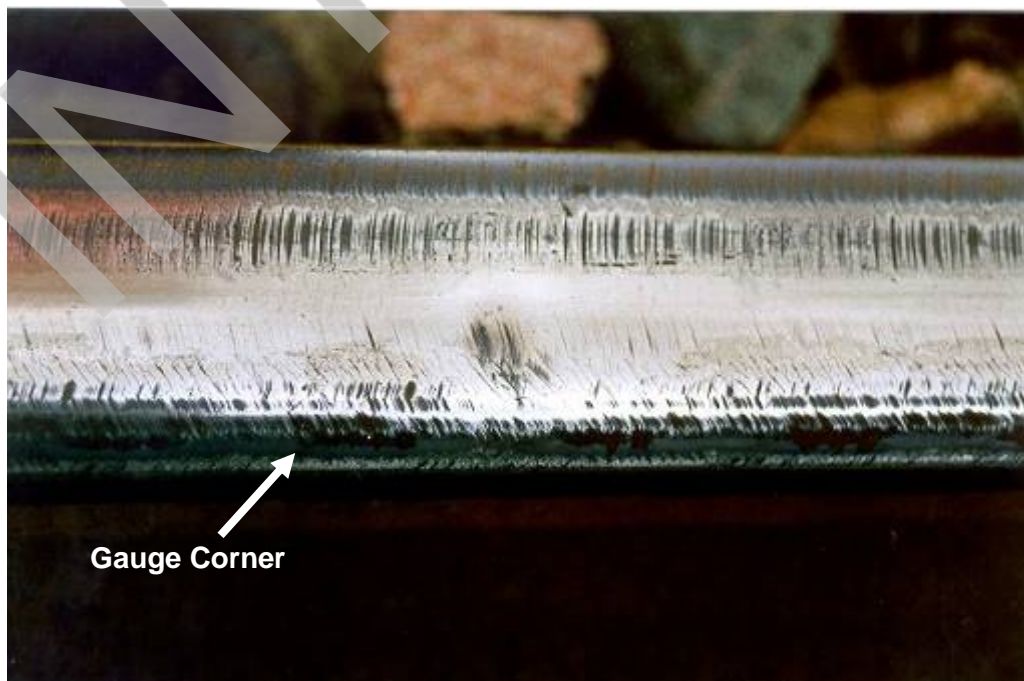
(a) Examples of Gauge Corner Checking Initiated Squats - Small
